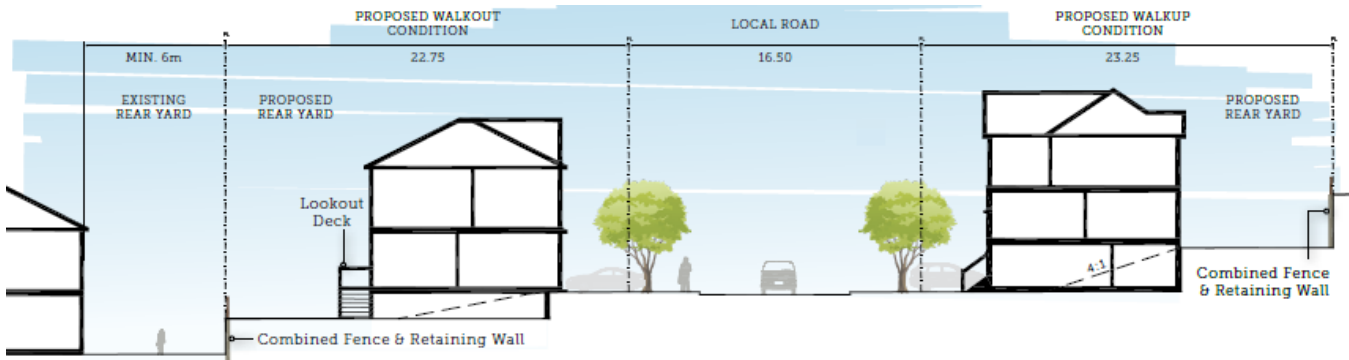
Cross Section of Lookout (Left) and Walkup (Right) Dwelling Conditions
